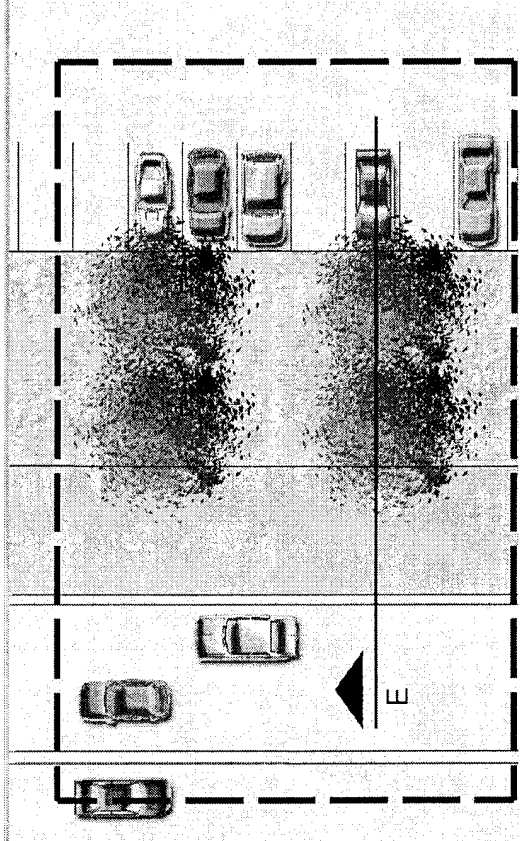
DETAIL PLAN D - BUFFER ZONE/END ISLAND
